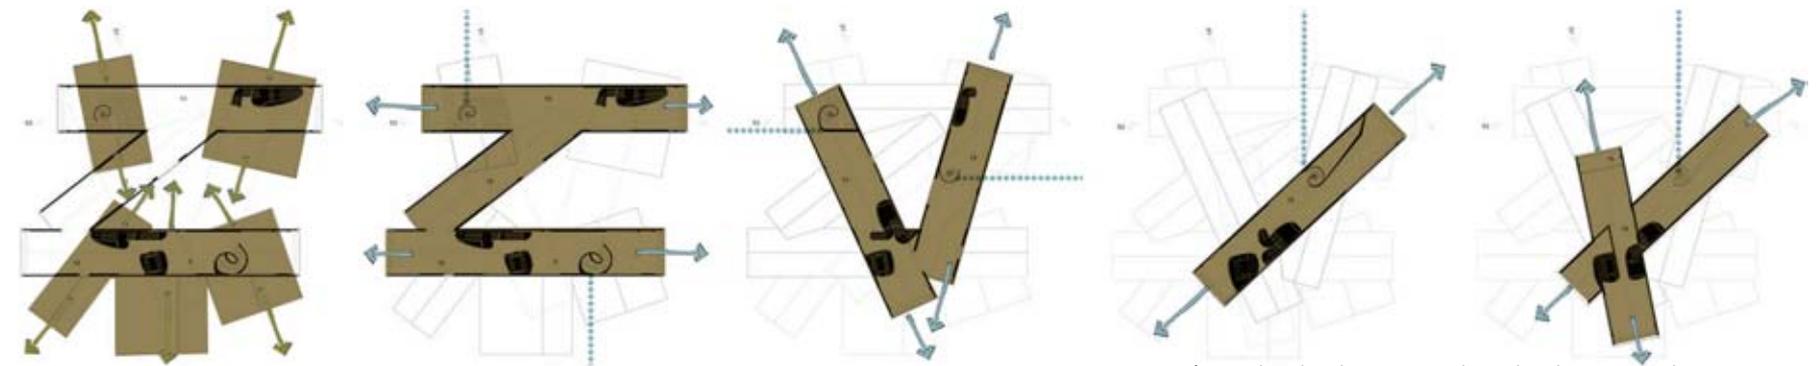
Floor plans showing views and vertical circulation points (archspace, 2010)
